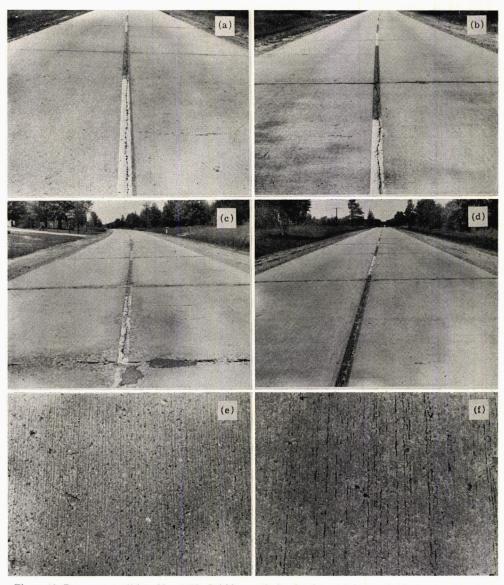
Pavement condition, May 1957; finishing methods, showing: (a) broom finish, wet earth curing, Section 1B-1, Sta. 625+00; (b) broom finish, cutback asphalt curing, Section 2B, Sta. 620+00; (c) broom finish, wet straw curing, Section 1B, Sta. 377+10; (d) broom finish, asphalt emulsion curing, Section 2A, Sta. 384+00; (e) texture of broomed surface, Section 2A, Sta. 384+20.
